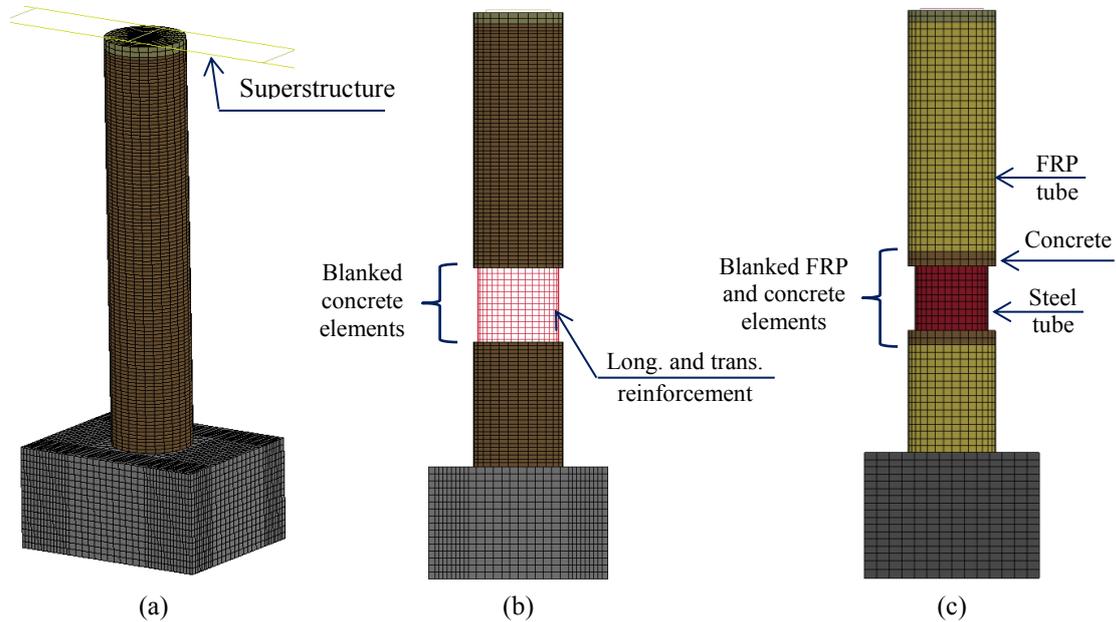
Columns FE modeling: (a) 3D view, (b) RC-column, and (c) HC-FCS column
